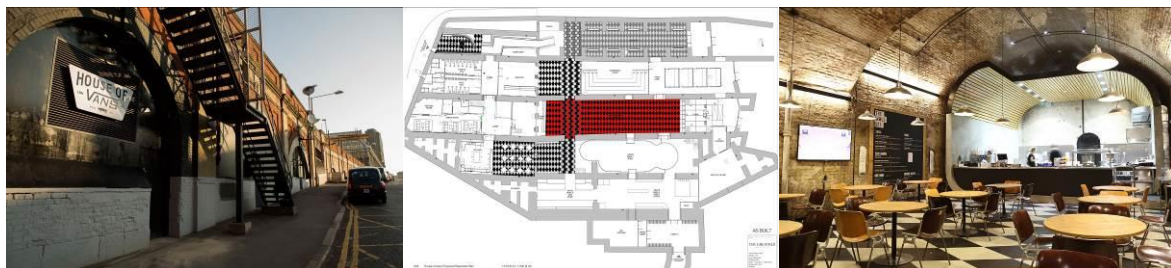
(a) House of Vans, street façade; (b) Building layout; (c) View of the Café
